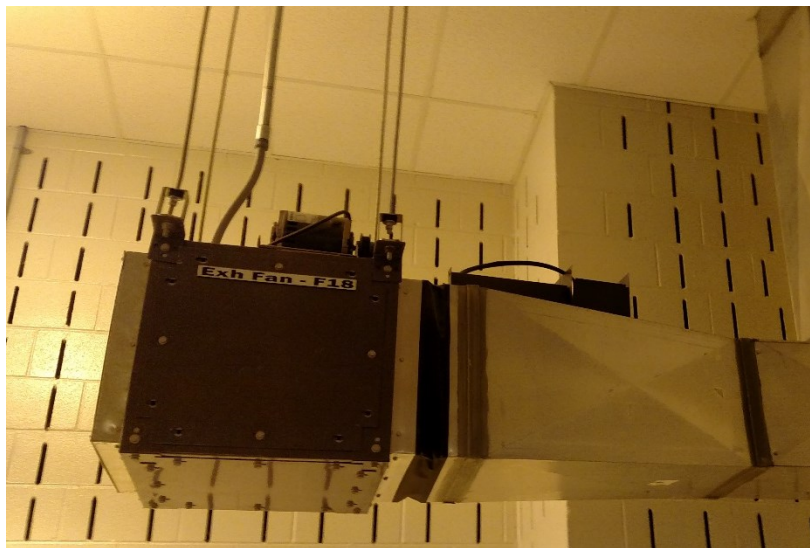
Lower Scioto WRF – Exhaust Fan F-18
